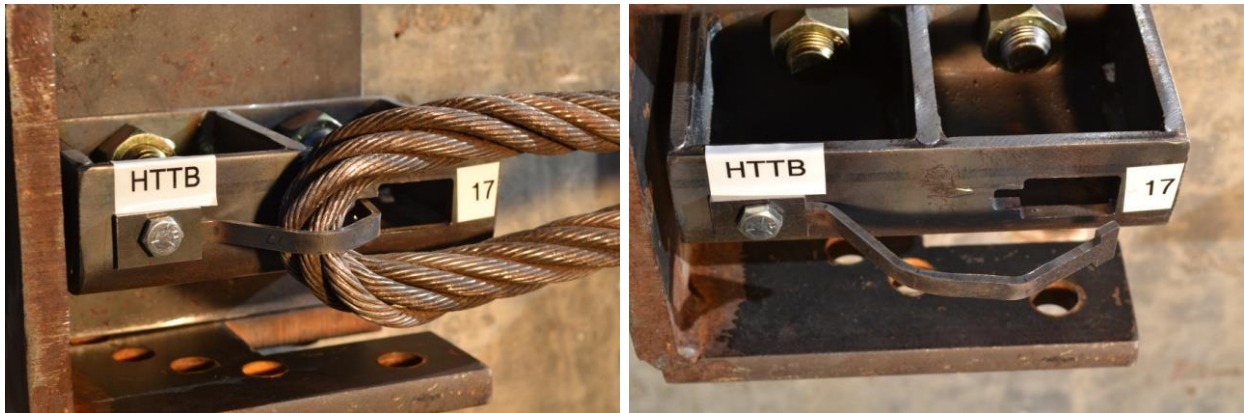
Pre-Test and Post-Test Photographs, Test No. HTTPB-17
